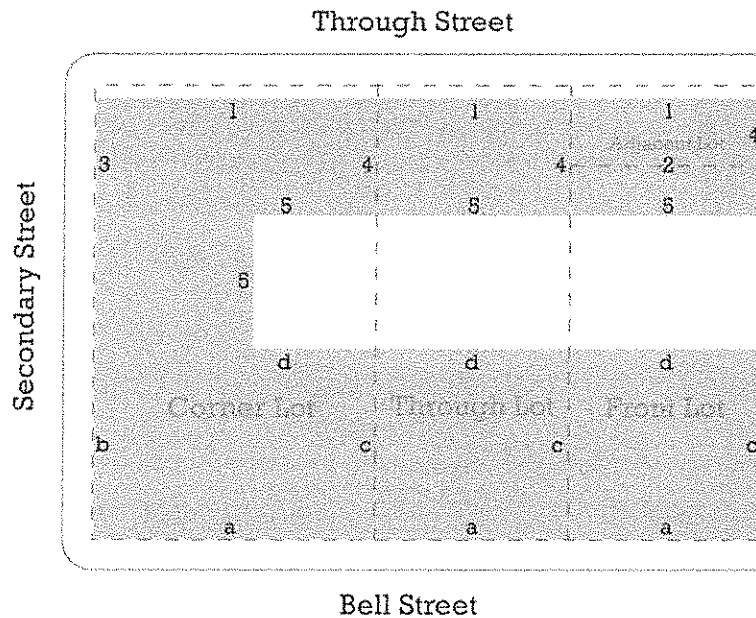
Setbacks and Build-to-Lines for Structures
